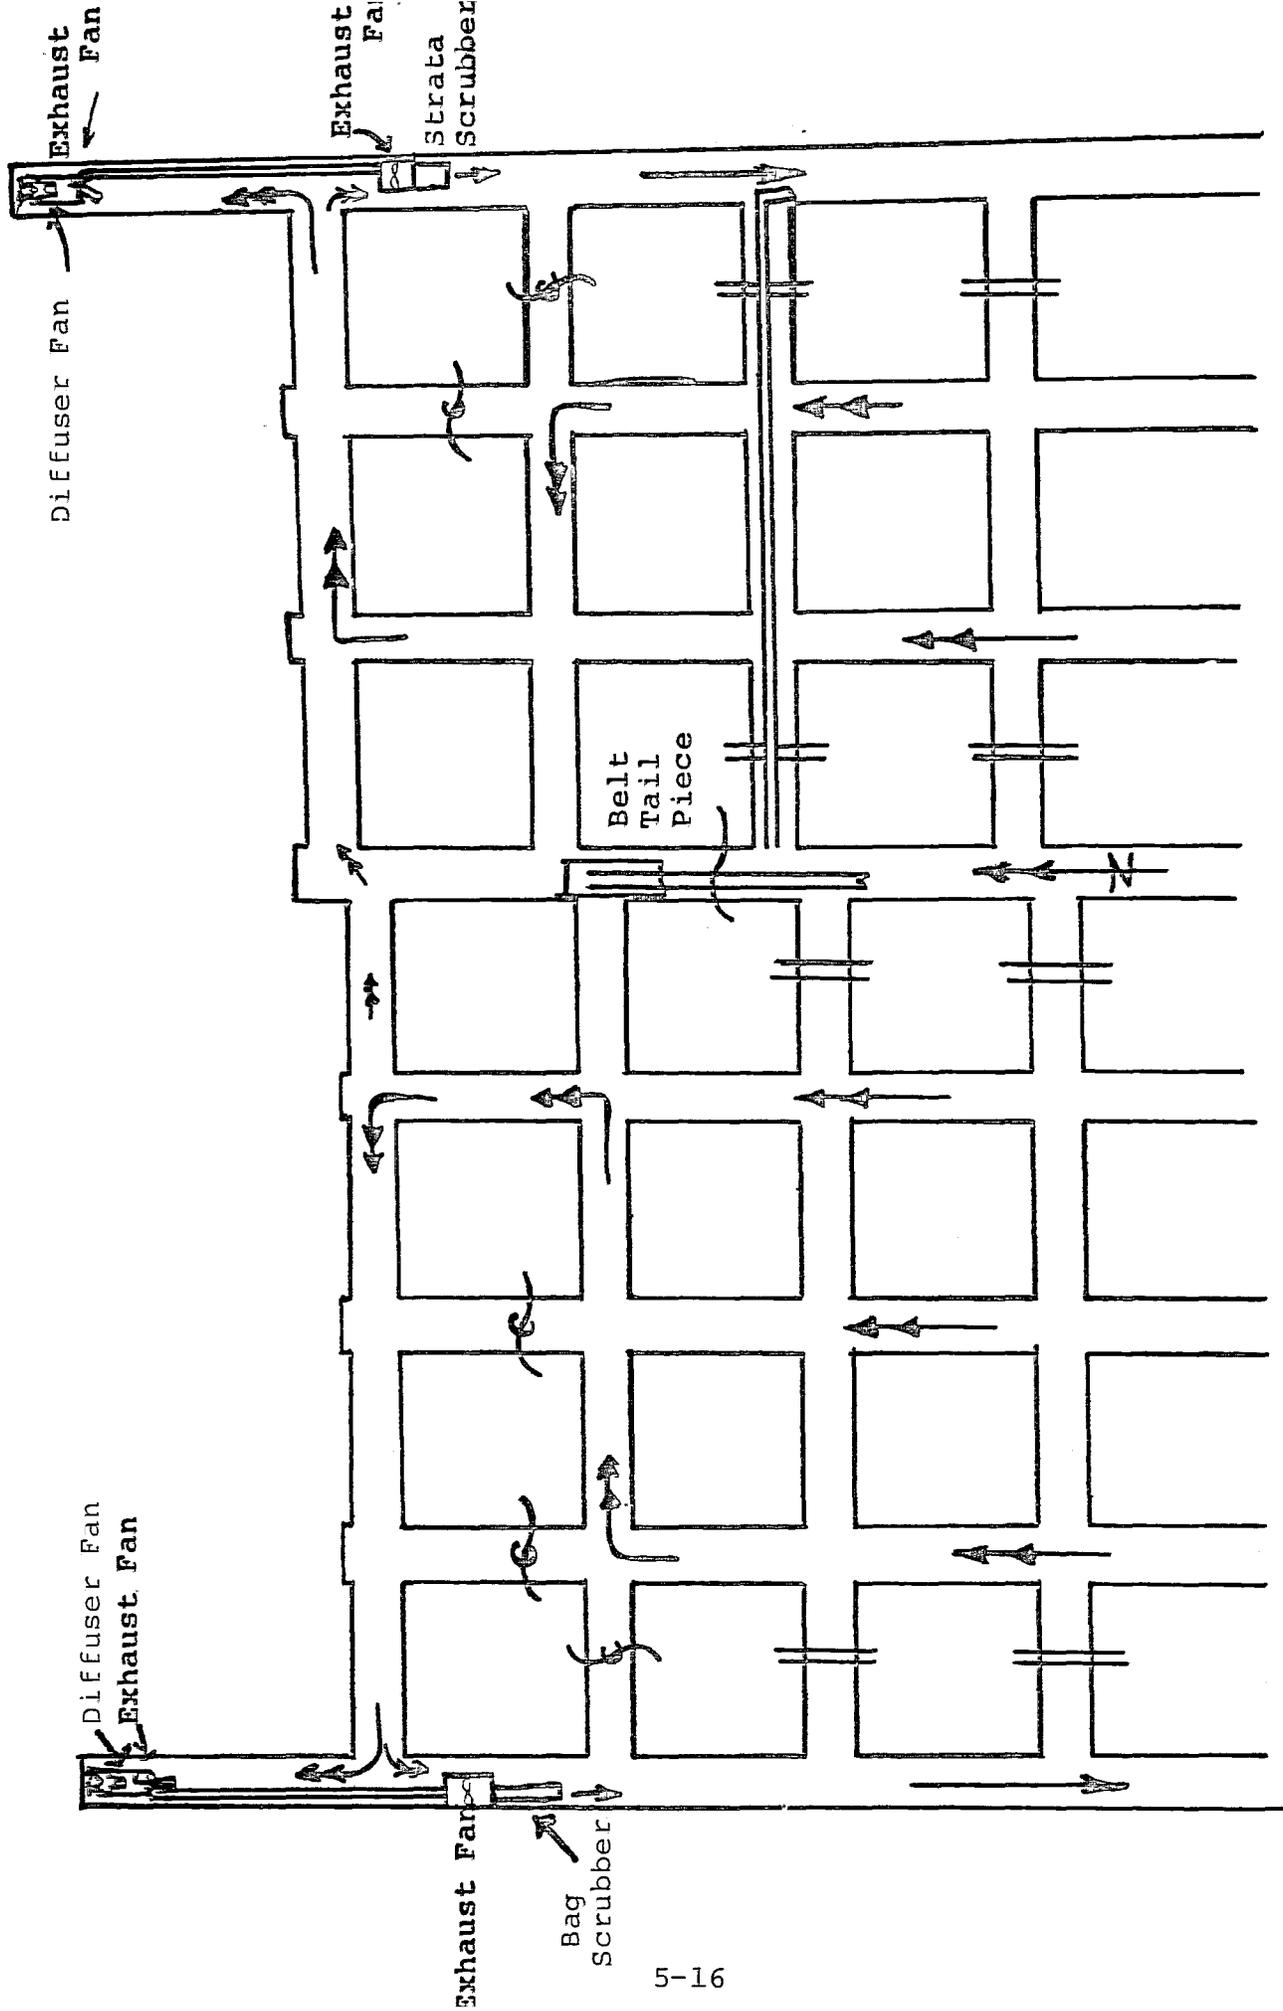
Ventilation System for Main Entry Development Using Marietta Twin Borers Equipped with Exhaust and Diffuser Fans.
